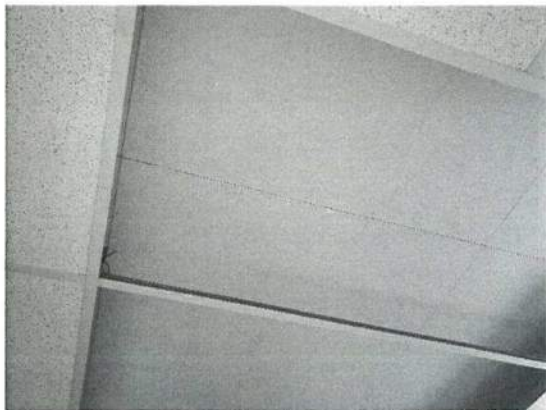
OSB Ceiling Tile – 2nd Floor Above Ceiling Tile (ND)
